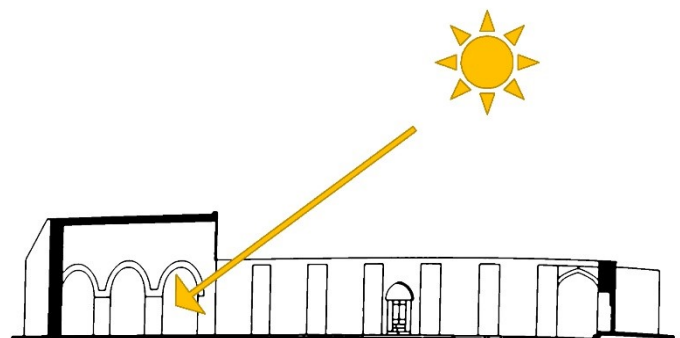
Iwan* in the architectural section and sunlight beams, a sun-shade role.
